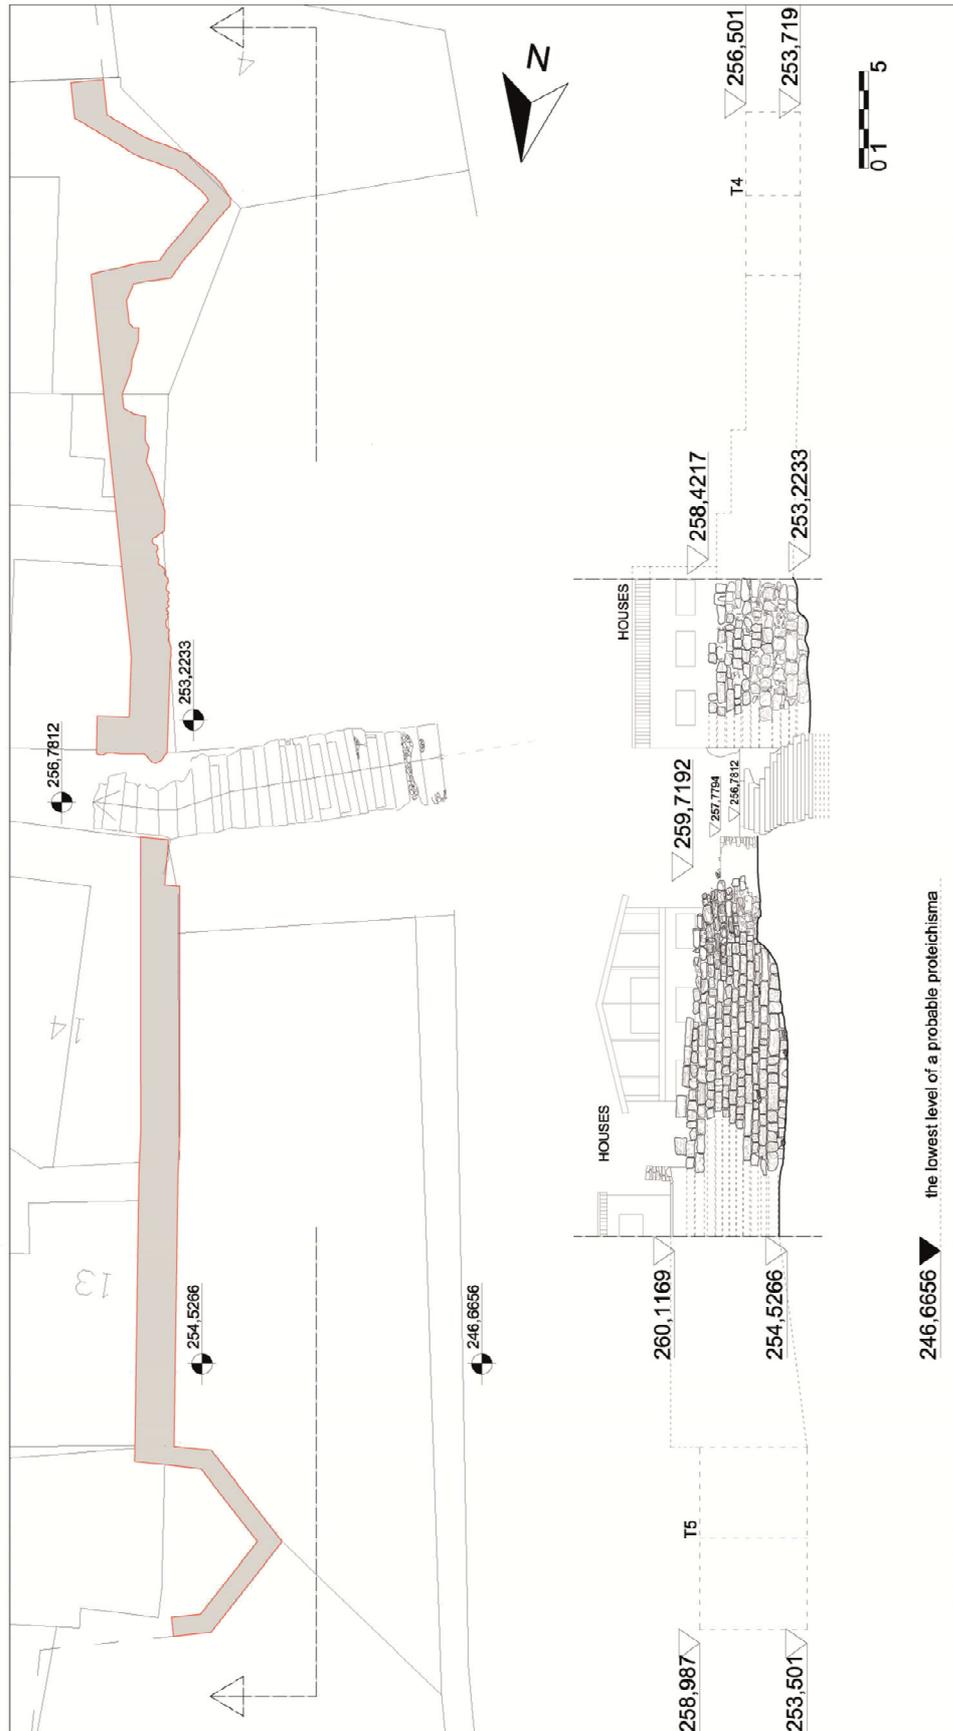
W5 and W6, plan and the elevation, drawing by author (2014).
